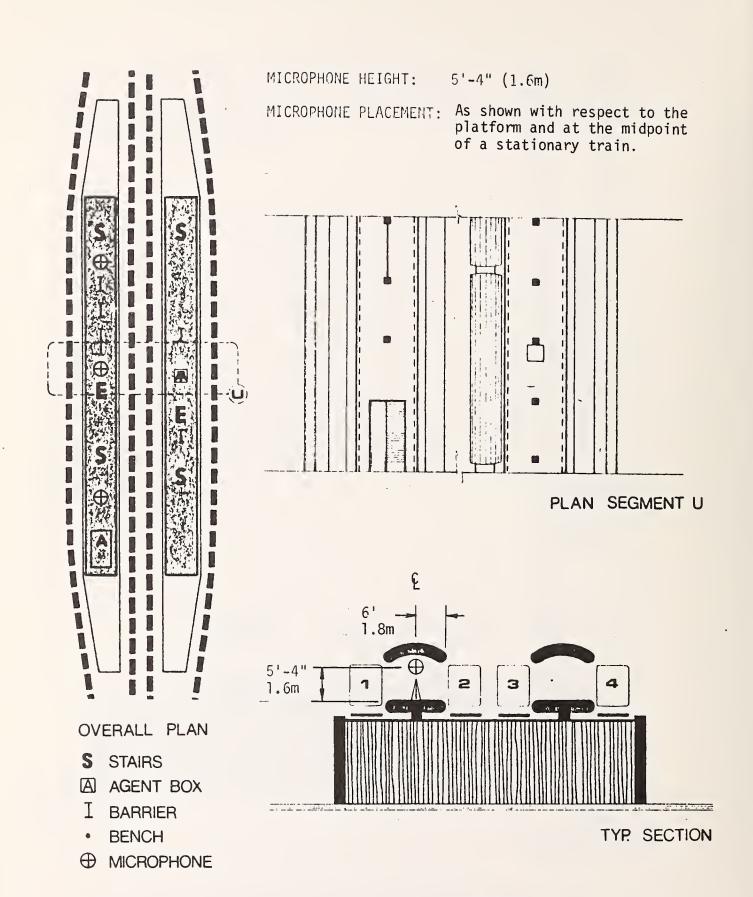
Dual Center Platform Elevated Embankment Station Configuration (Station Type 5)
